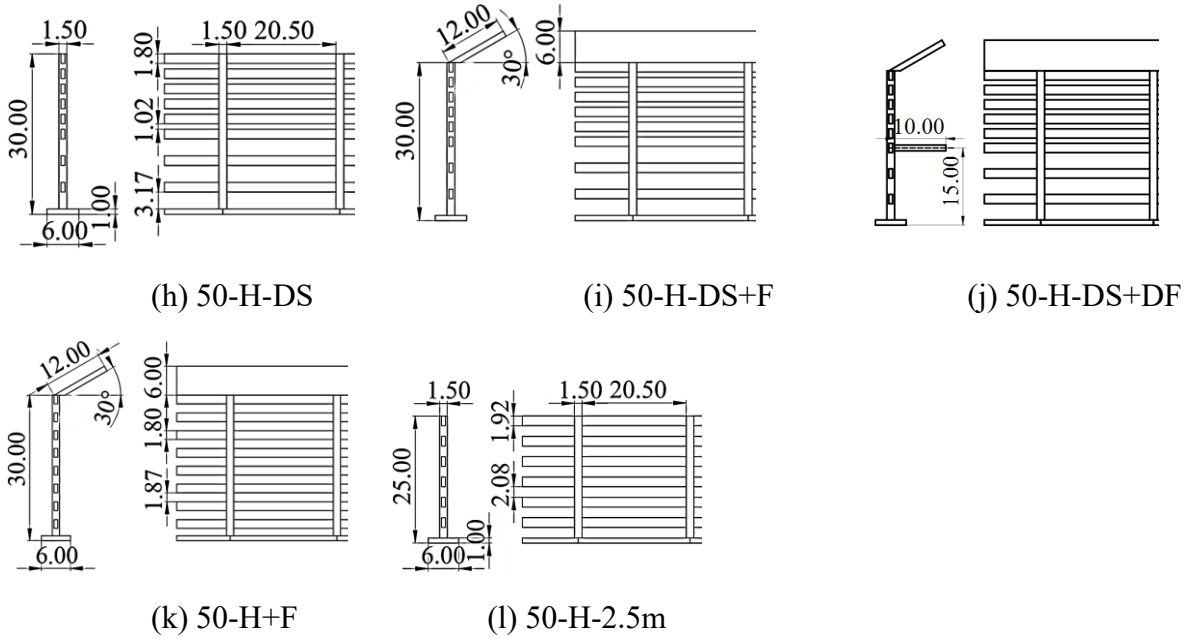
Details of wind barrier models (unit: mm; scale: 1/100)
